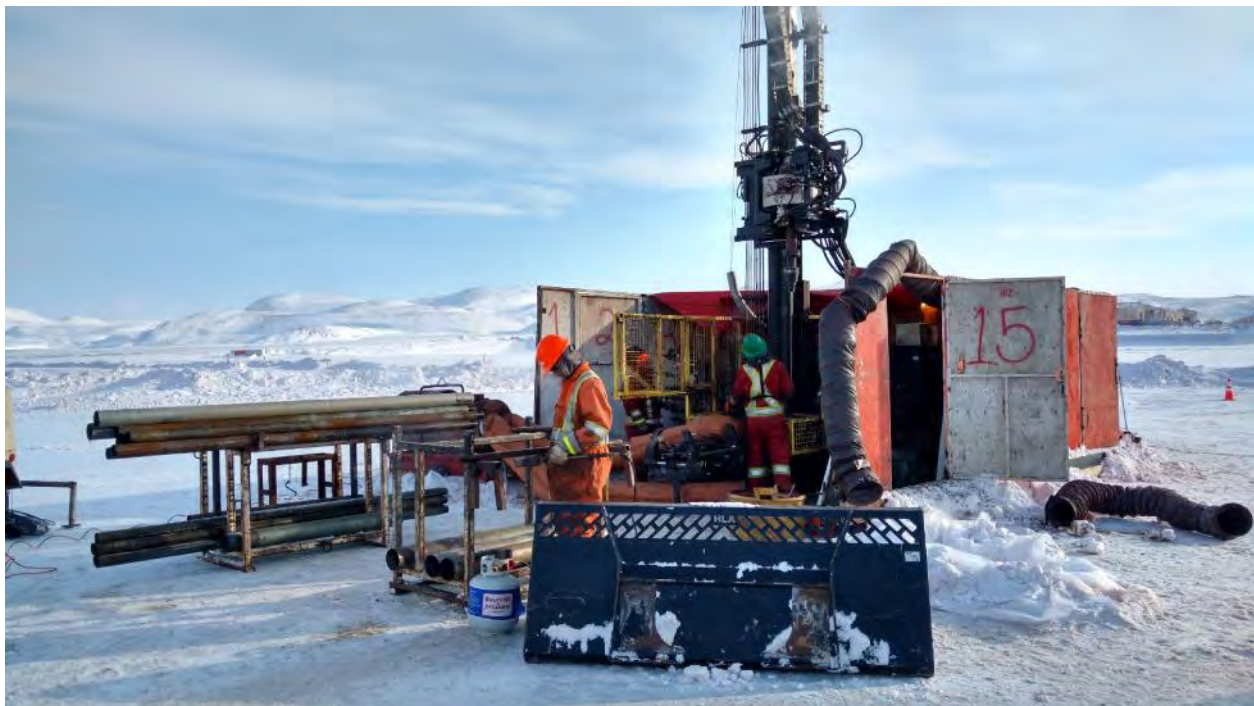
Geotechnical Drilling Operations at BH17-D004, March 2017
